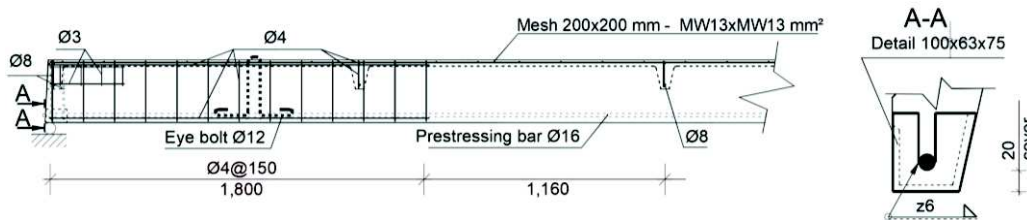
Prestressing and reinforcing steel details of the ribbed panel PNS-12 (PK-01-111, 1961). *Dimensions are in mm.
